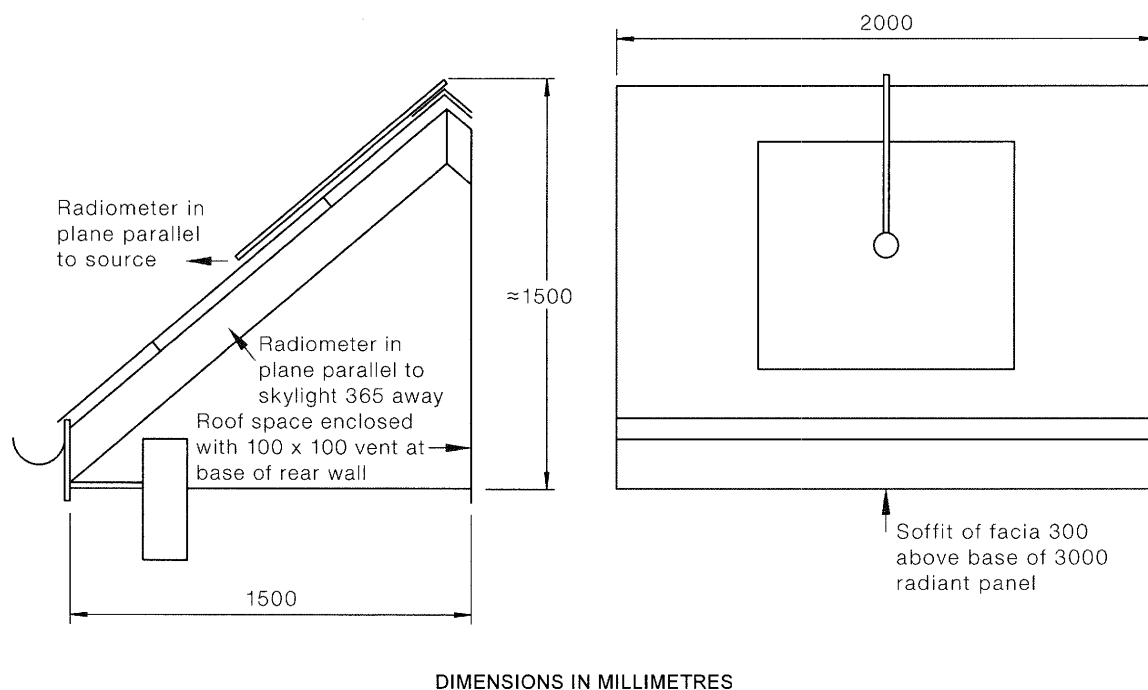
STANDARD CONFIGURATIONS FOR ROOFING SYSTEMS
